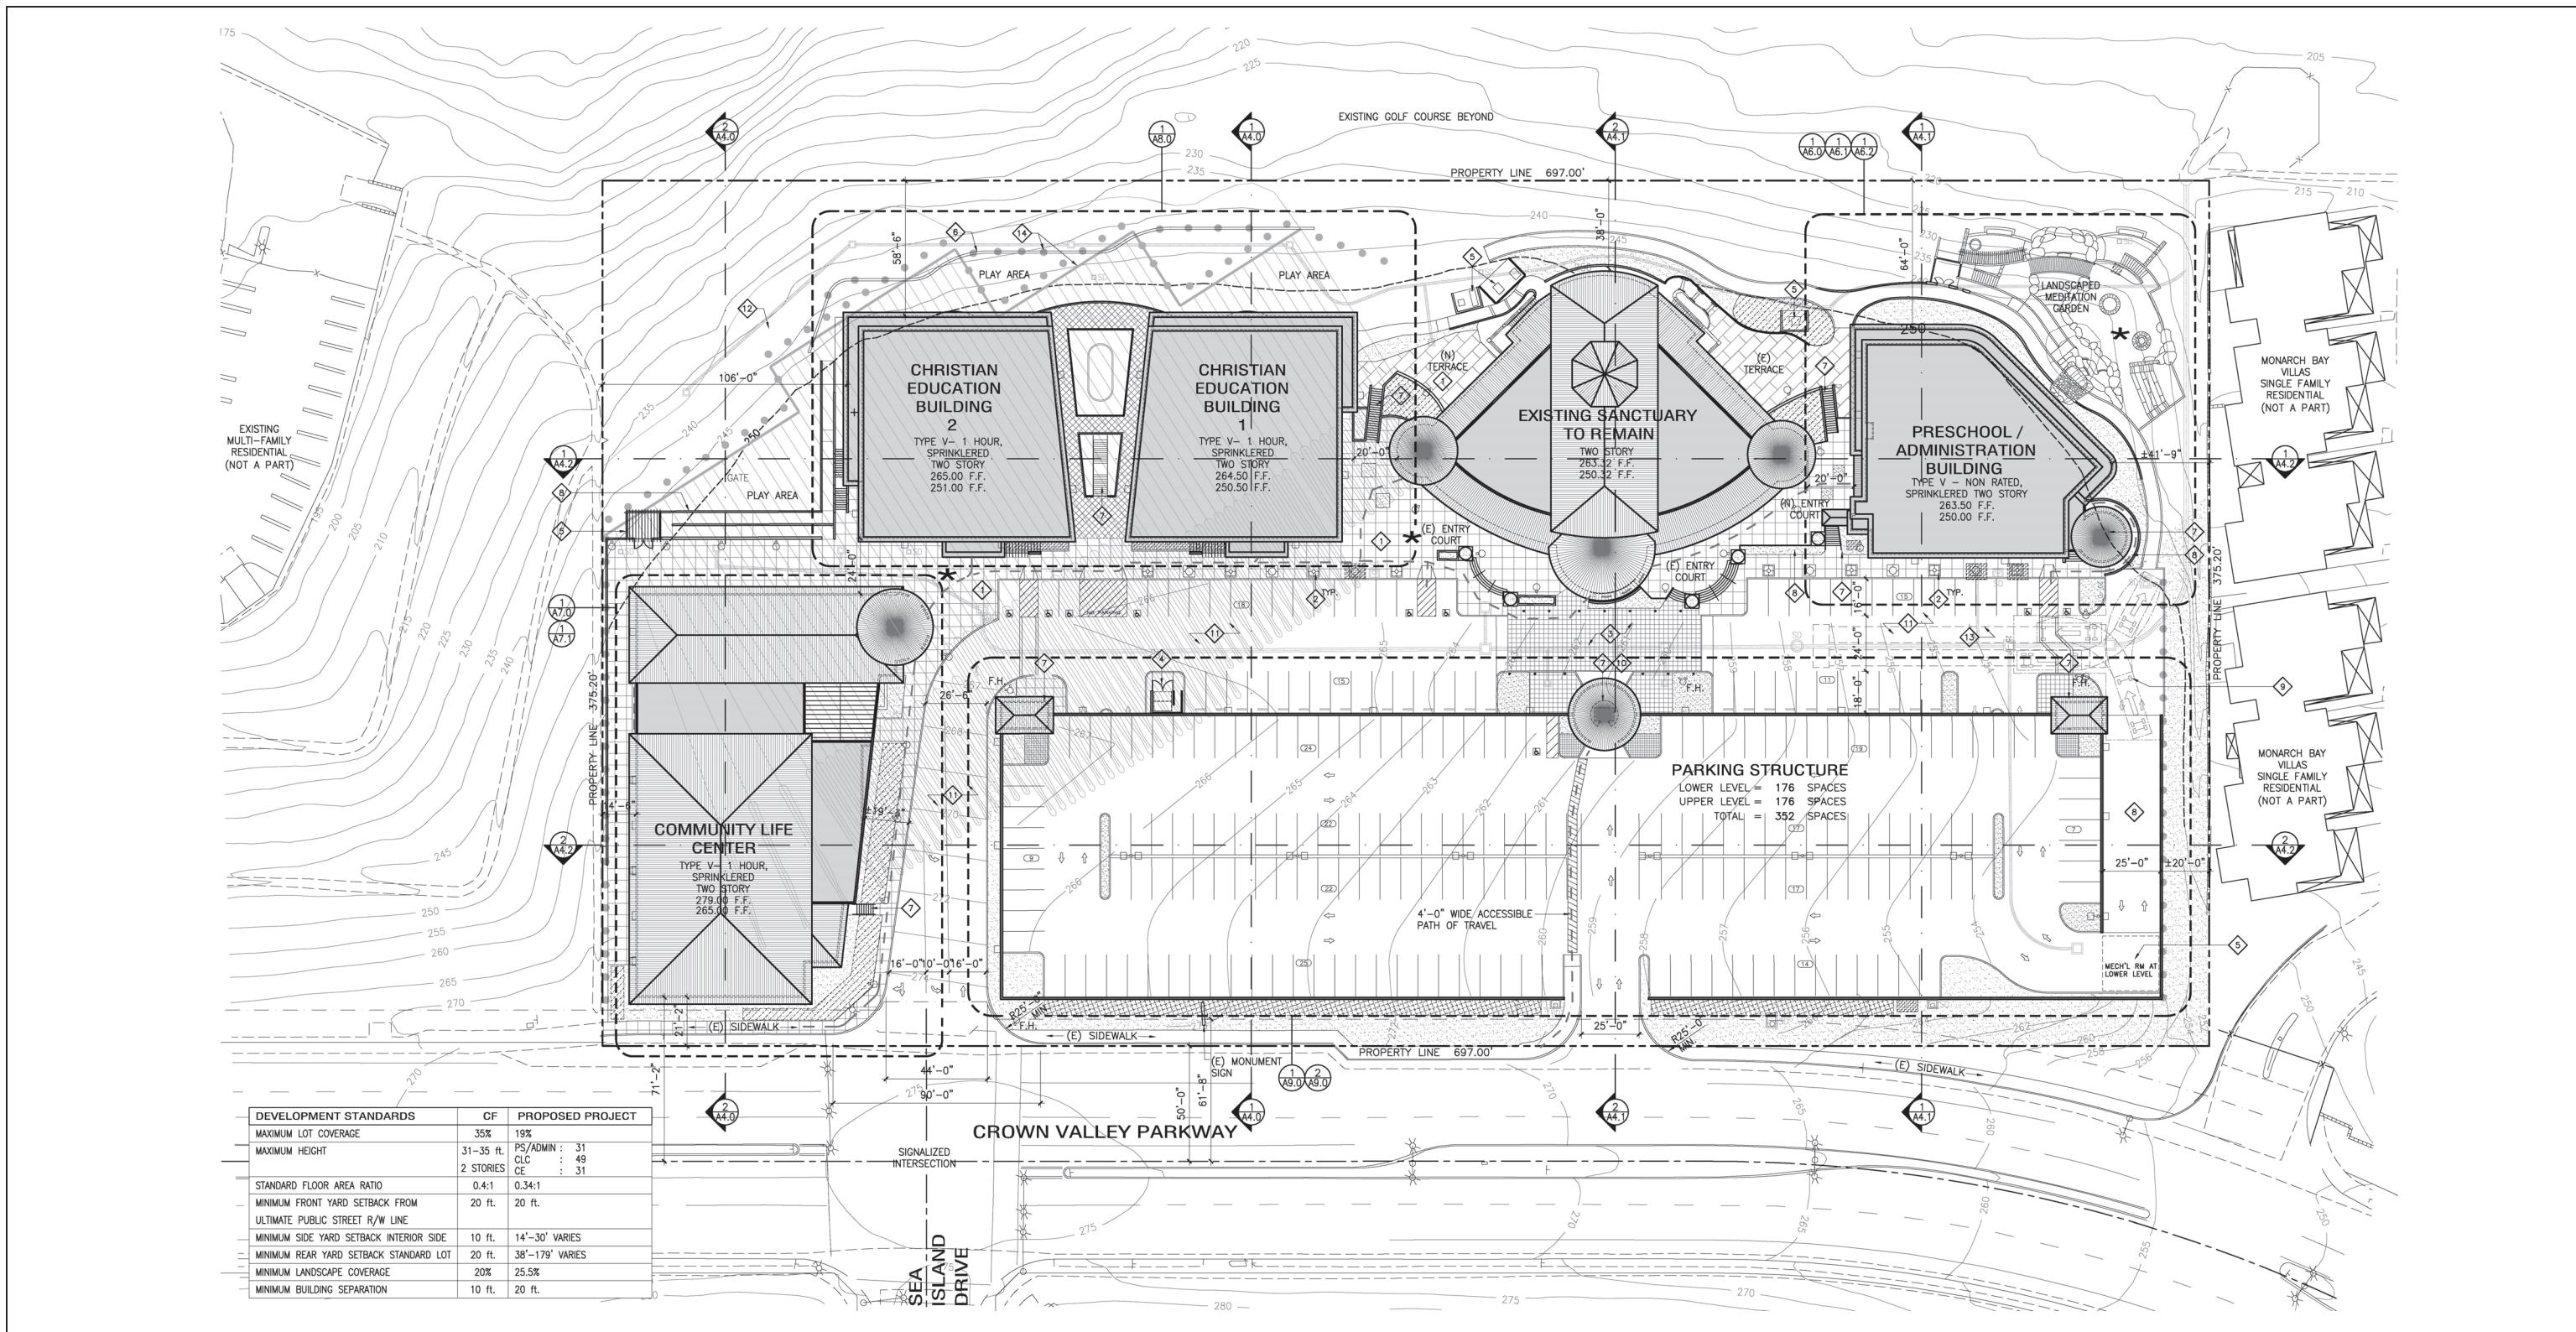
illustrates the project site plan. Access to the project site will continue to be provided at a full-access driveway (the east leg of the signalized intersection of Crown Valley Parkway/Sea Island Drive) and an unsignalized RIRO driveway along Crown Valley Parkway.
